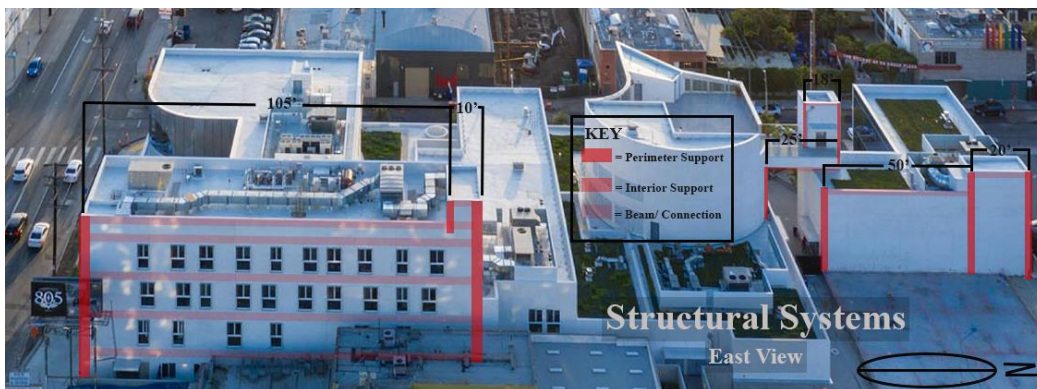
East View: Structural Systems. Adapted from Archdaily, Leong Leong, & KFA
